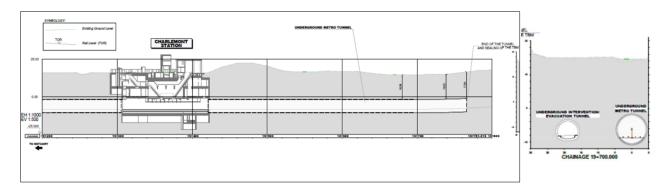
Long Section and Cross Section through Turnback Tunnel
